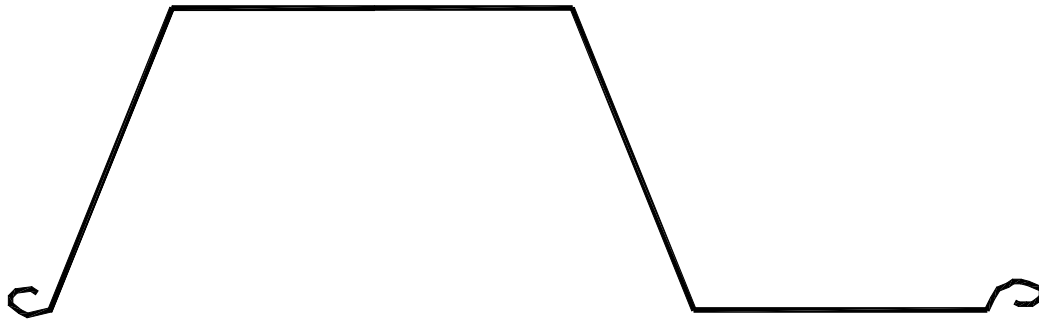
Typical section configuration of arch shaped and lightweight gauge steel sheet pile (website of Atlantic Sheet Pile, Inc.)
